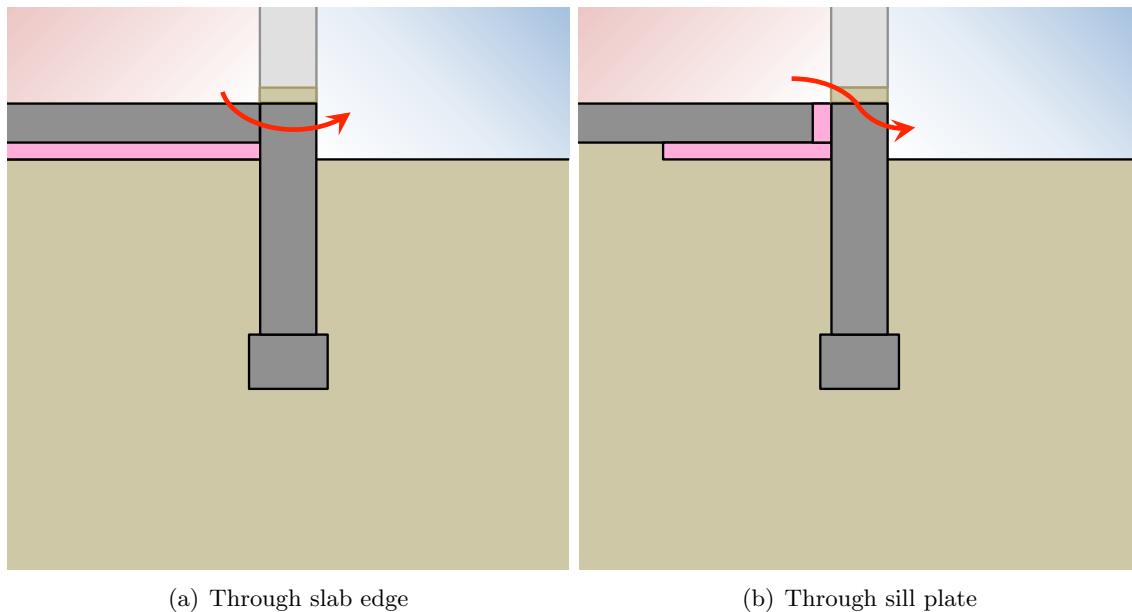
Examples of thermal bridges for a slab-on-grade foundation
